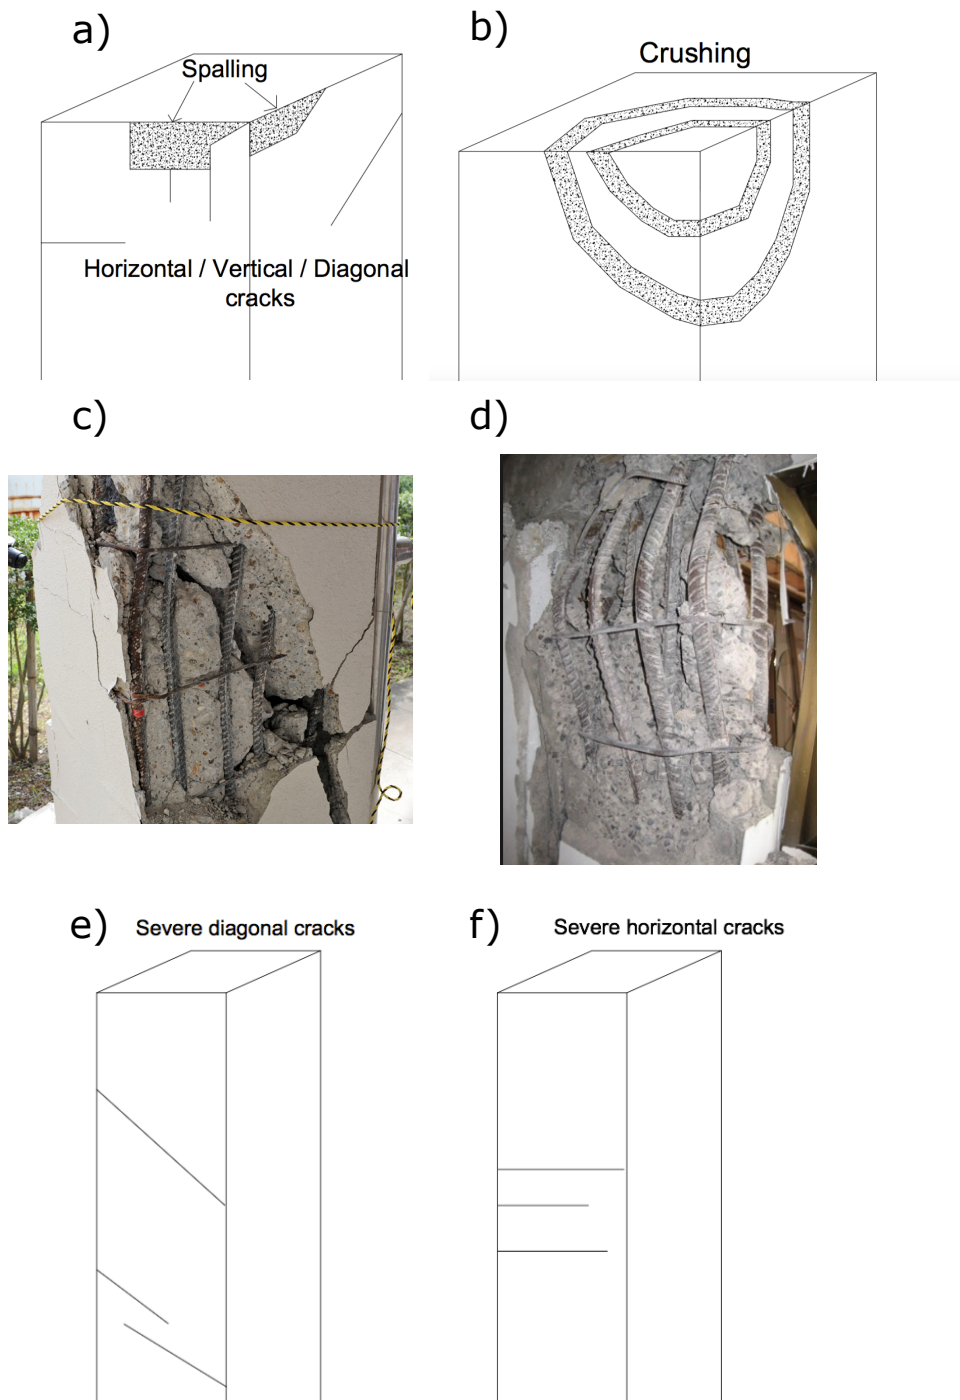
a) Spalling in concrete. b) Crushing in concrete. c) and d) Bucking of rebar. e) and f) Severe diagonal/horizontal cracks
